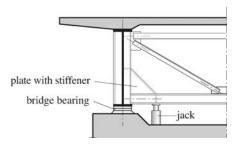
Jacking details for lifting the bridge and for bearing replacement.
